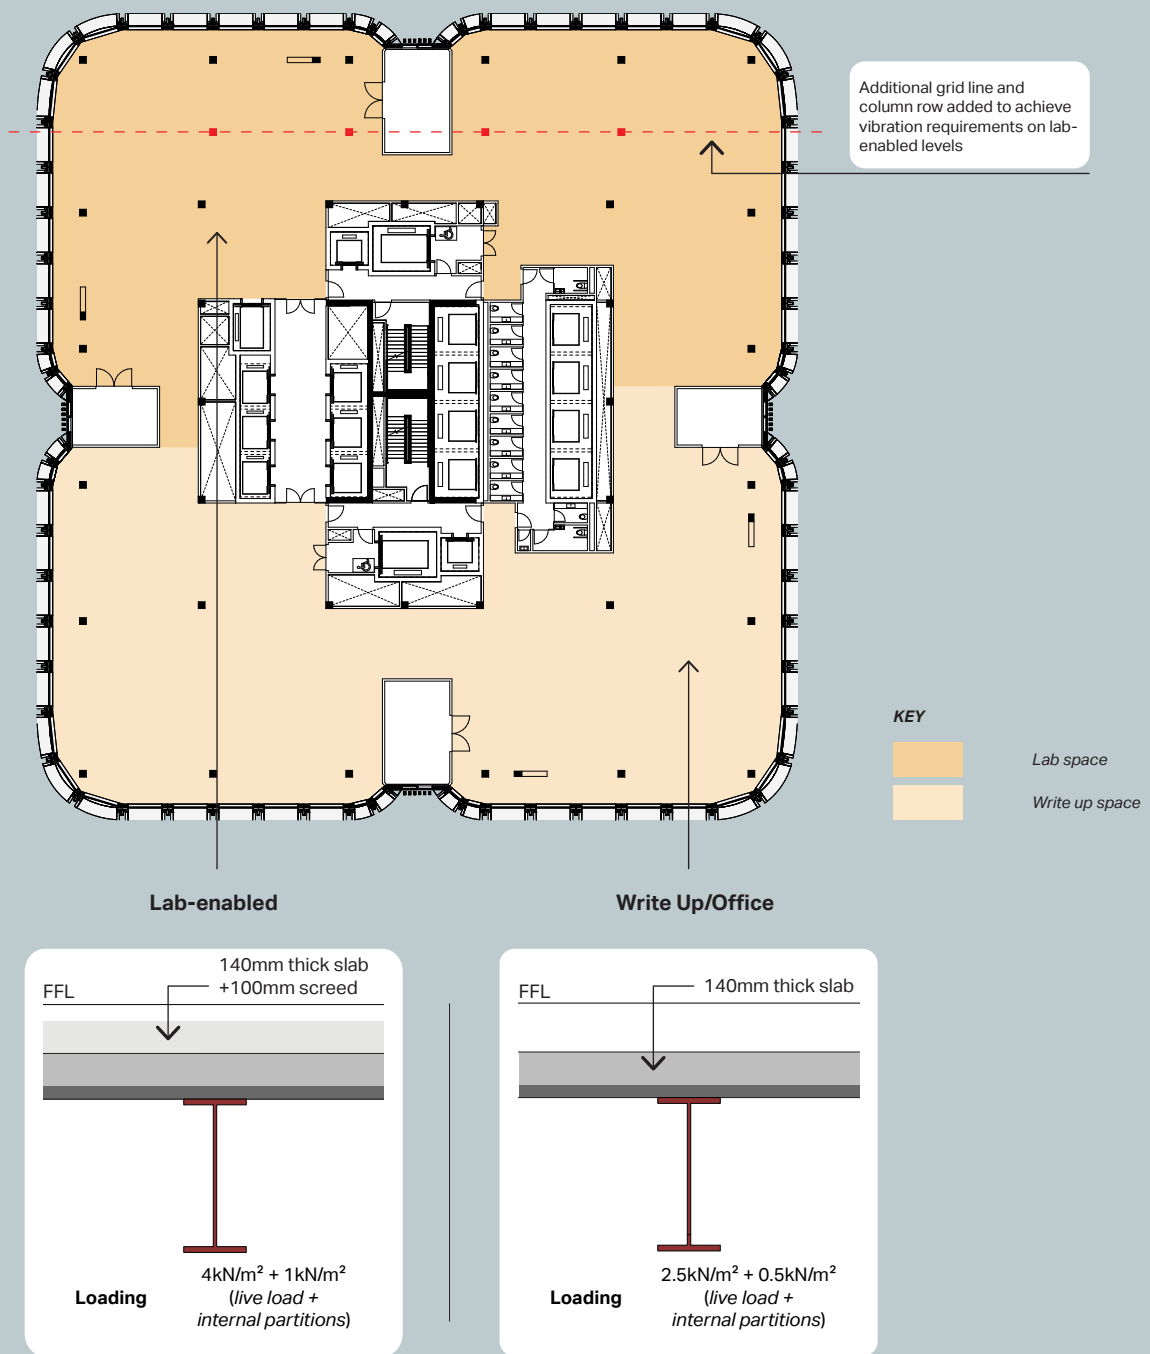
Indicative lab-enabled floorplate structural build up and loading
